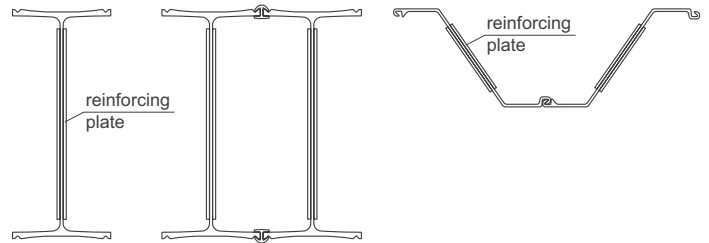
Reinforcing of the tip of the pile with steel plates / shoes welded on the king pile toe.
